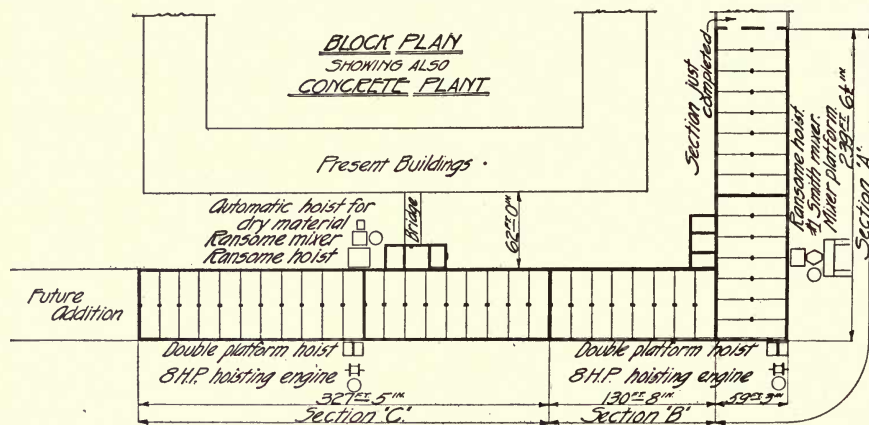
Plan of Construction Plant. (See p. 138.)
